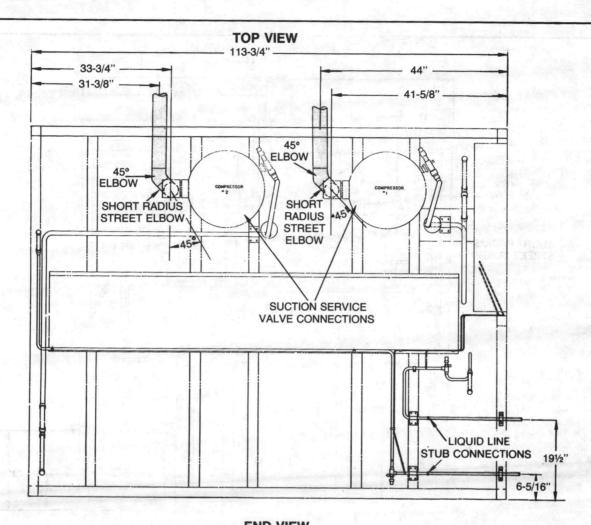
Piping Installation: 40-Ton Units Without Isolators
